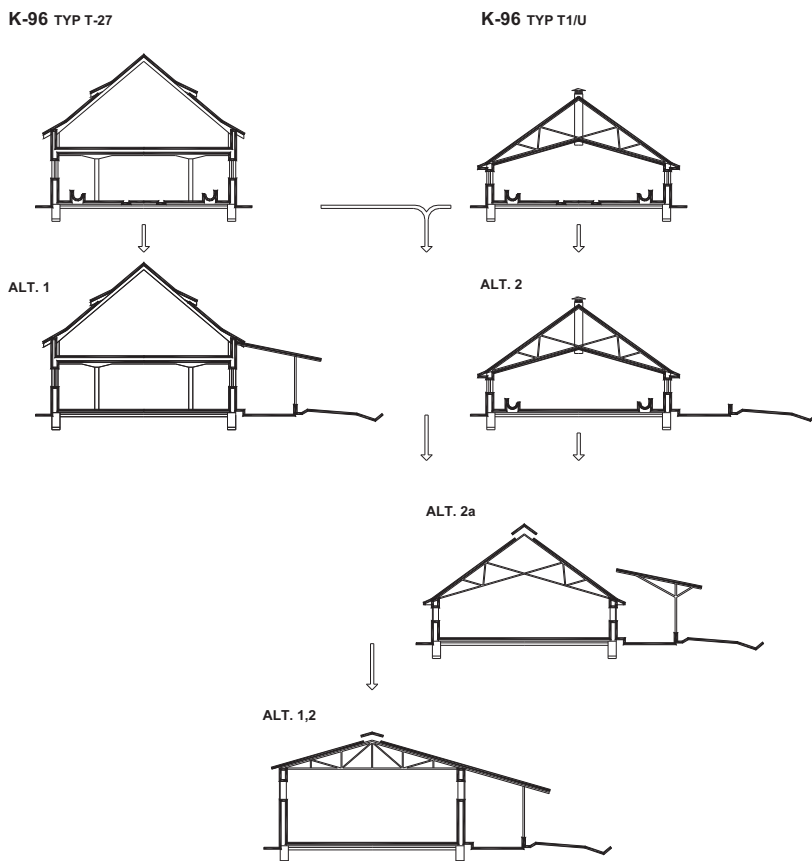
Reconstruction of standard stall buildings, T-27 and T/U types
